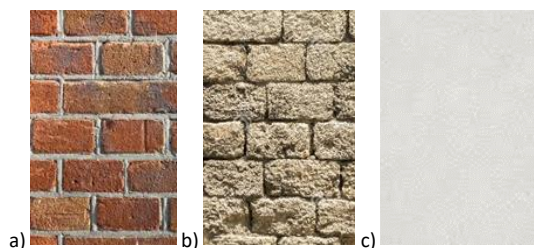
Analyzed building materials for historic buildings: a) brick masonry, b) limestone, c) plaster.
